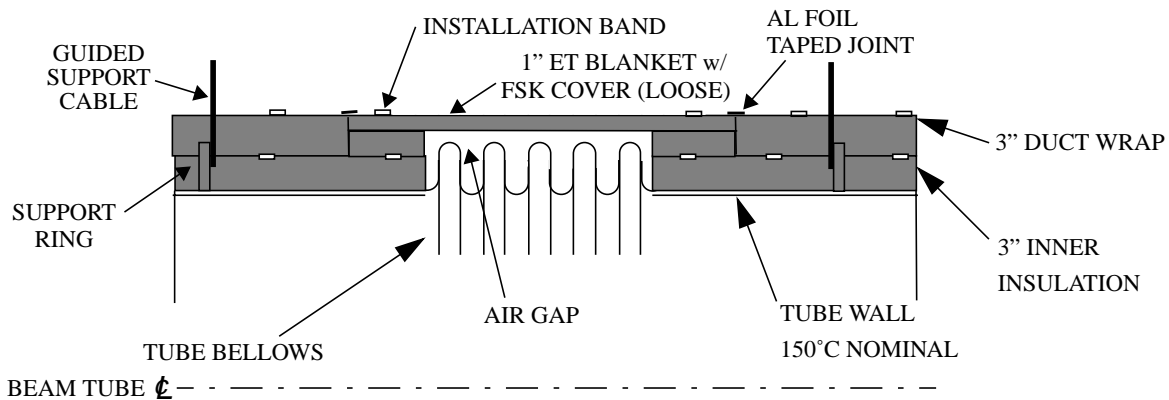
Schematic illustration of insulation installation at guided supports and bellows
